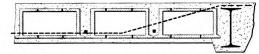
Cross Section Through Floor Slab on Line A-B of the Plan, Fig. 2.
